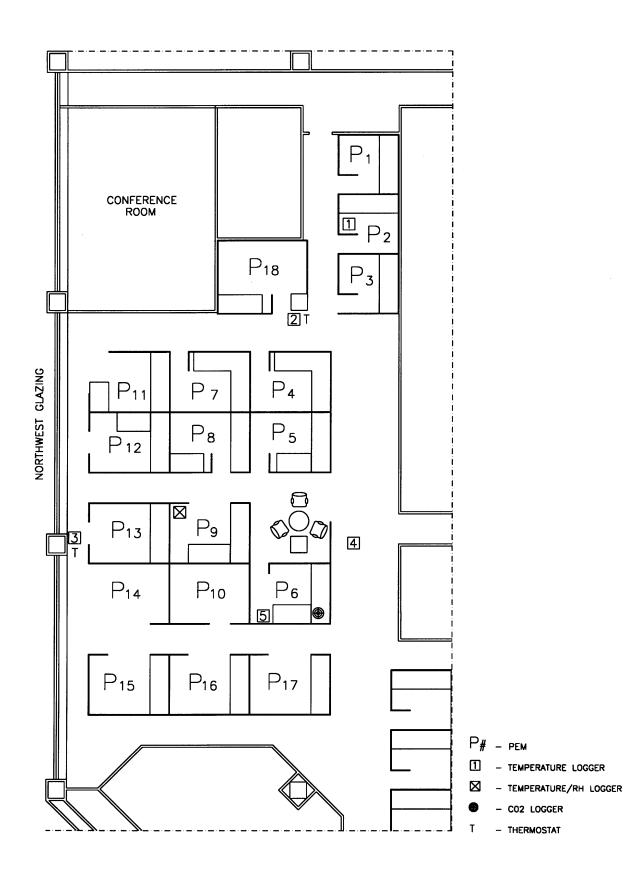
Floor Plan, PEM Group, 22nd Floor of 1455 Market St.
